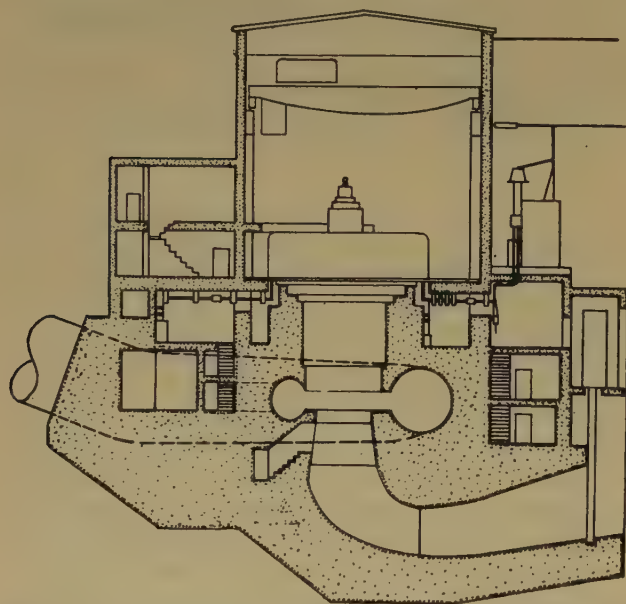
Cross section of a typical moderate-head plant, with transformers located on the tailrace deck
